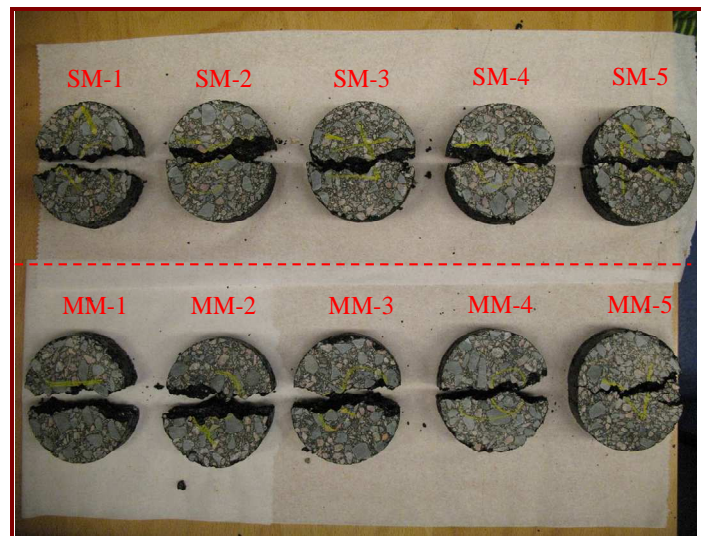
Fatigue failure outlines of all mixture specimens
